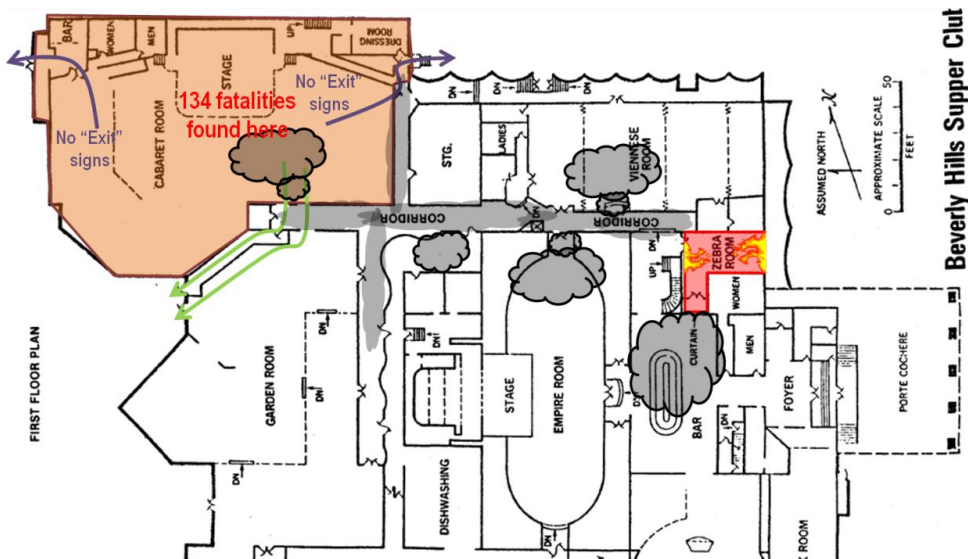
Fire scenario marked on the plans of the building, original building plans taken from [9].
